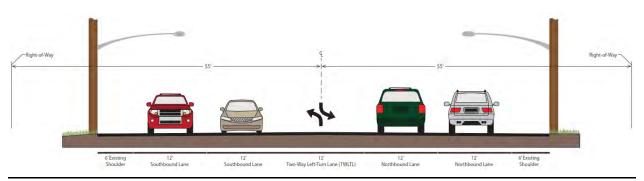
Existing Typical Section – Segment 4 (NE Furneys Lane to NE McWilliams Road)
